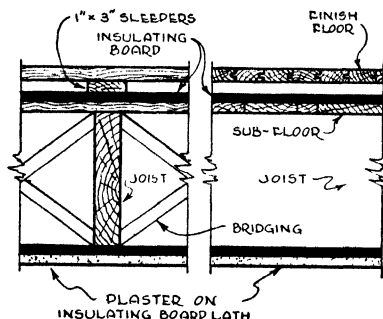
Floating Floor Construction on Structural Insulating Board over Frame Construction
